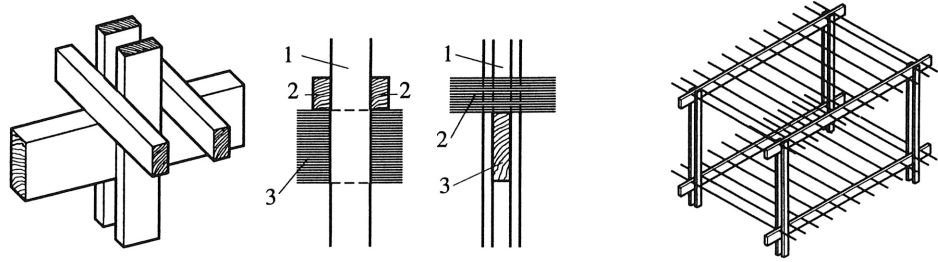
Single section main supporting beam and multiple-section multistorey column. (1) Column, (2) secondary beam, (3) main beam.
